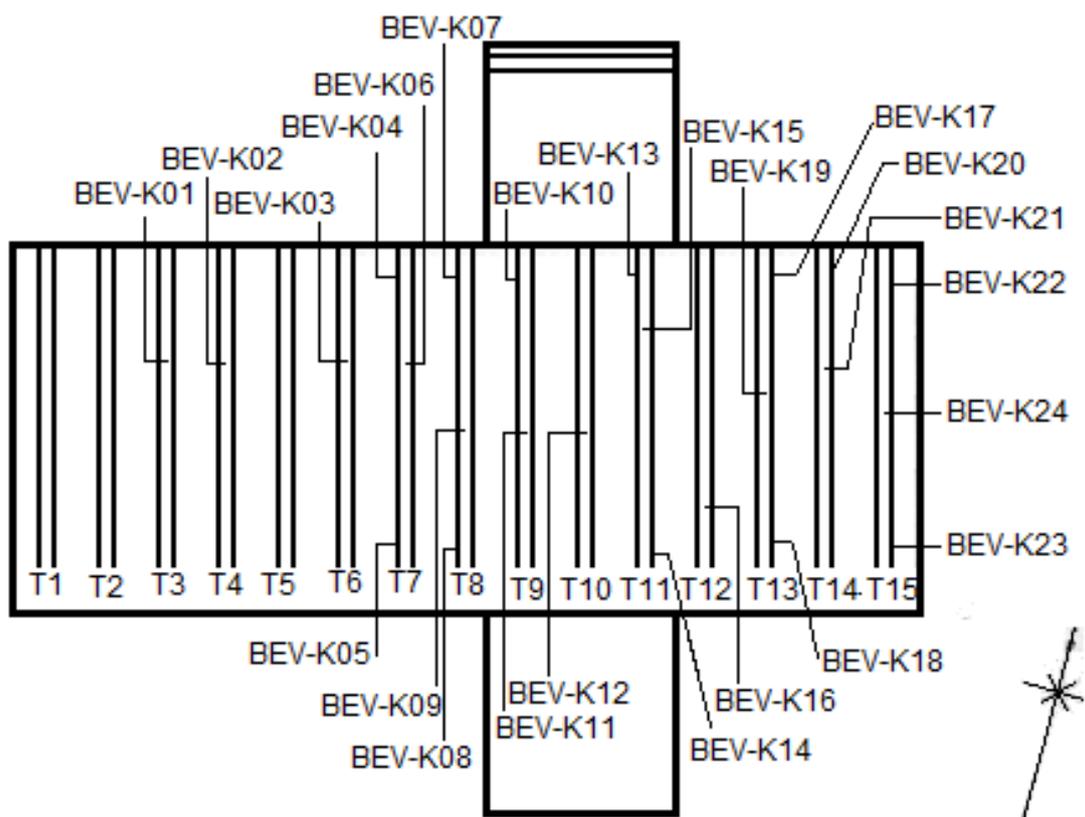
Sketch plan, showing the location of the samples BEV-K01– BEV-K24
